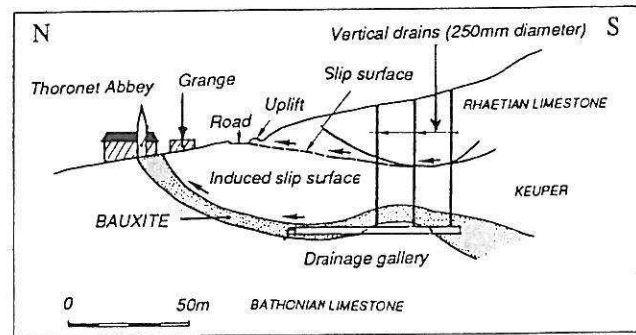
Cross-section of the drainage structures at Thoronet Hill (after Koch Paquier *et al.* 1990).
